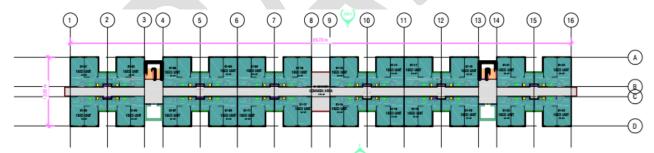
Affordable Unit Typology - Alternative Linear Floor Plan, One-Bedroom Block
